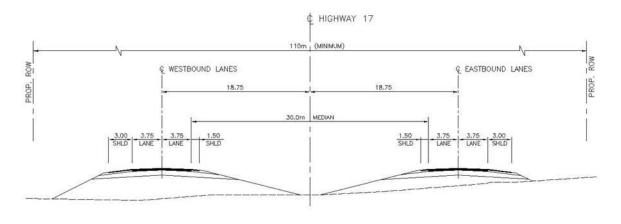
Typical Cross-Section of Widened/Improved/Realigned Highway 17
